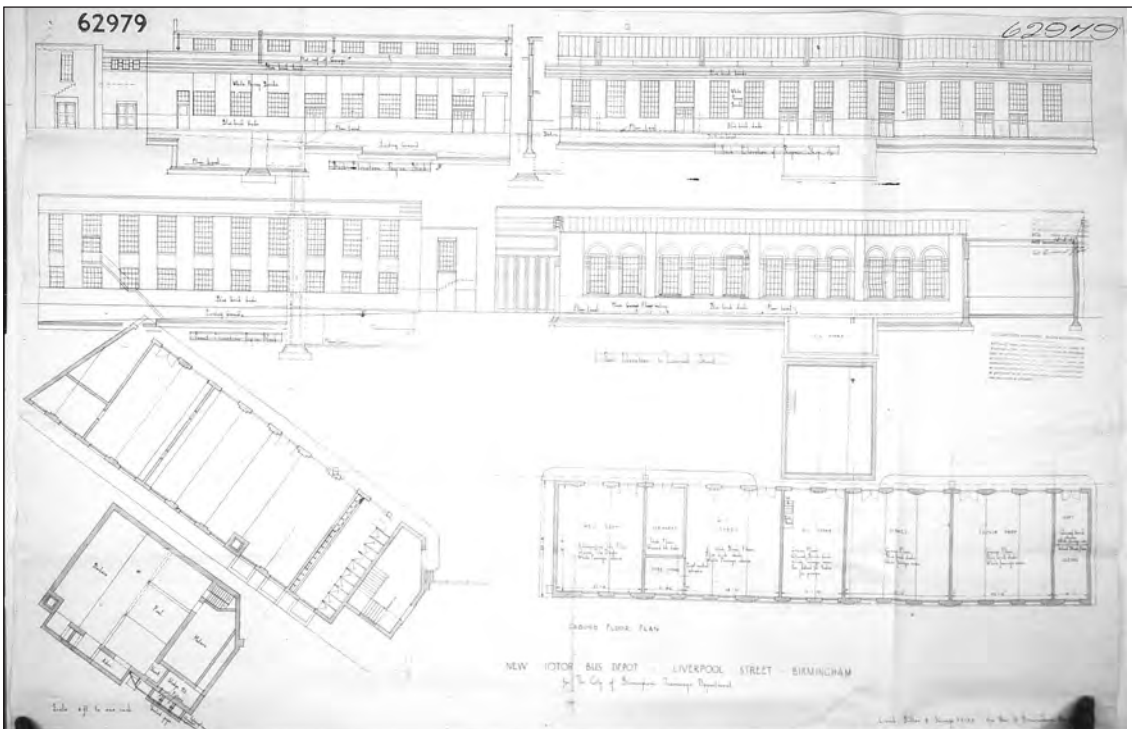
Elevations and partial plans, 1935, Crouch, Butler & Savage (Birmingham Archives and Collections, BBP62979, with permission of Sidell Gibson)
